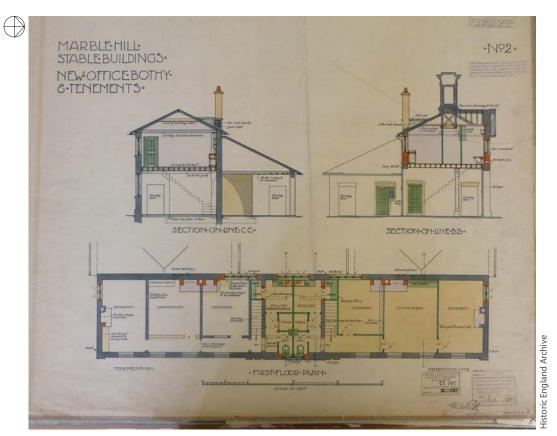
First floor plan of the Stable Block, for 'new office, bothy and tenements', c. 1905
